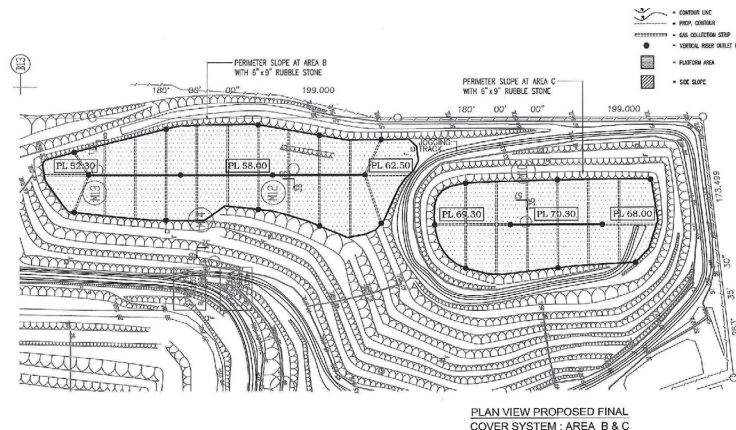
Plan of final cover system: Area B and C in Air Hitam Sanitary Landfill
